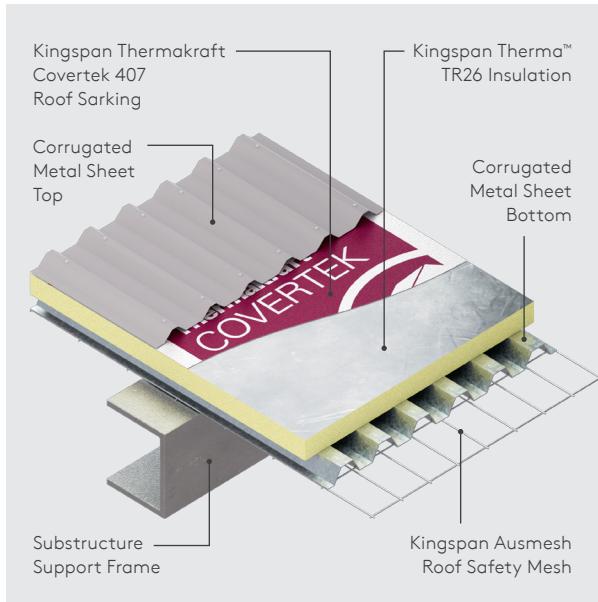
Kingspan Therma™ TR26 in a Built-up Metal Deck Roof.
